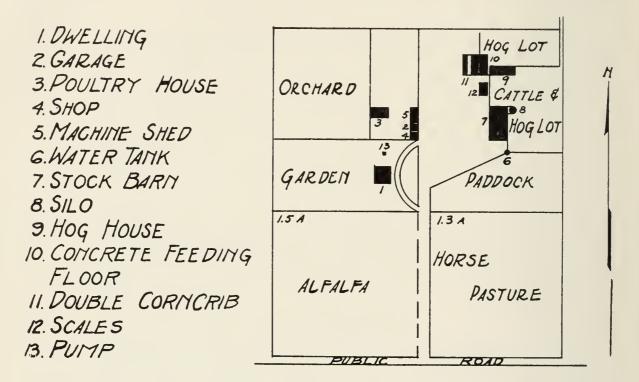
A GOOD LAYOUT FOR A FARMSTEAD ON A 160-ACRE CORN-BELT FARM The farmstead layout shown in this figure has the following advantages: (1) The house is some distance from the road, but an open view is made possible by placing the house in front of other buildings. (2) The garden and orchard are adjacent to the house. (3) The poultry house is adjacent to the orchard, which provides runway for the poultry when it is needed. (4) The garage can be reached from the house without having to pass thru the barn lot. (5) Shop, garage, and machine shed are grouped to facilitate repair work. (6) The barns are to the east and north of the house, away from the prevailing winds. (7) The machine shed is on the way from the house and barn to the fields. (8) The water tank is accessible from three lots. (9) The feeding floor for the hogs is adjacent to the corncribs. (10) The buildings are as compactly grouped as fire hazard will permit, thus economizing on time spent in work about the buildings.
